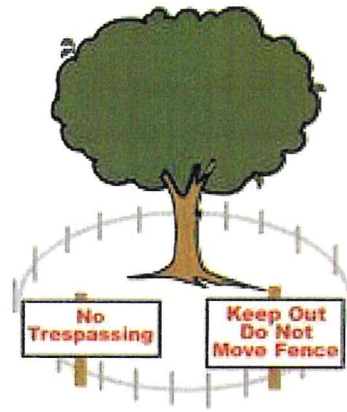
Placing a protective fence around the critical root area assures tree survival.
